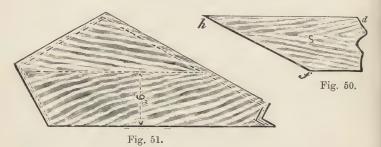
Piece left from Cutting Out Winder. Fig. 51.—Middle Winder.
